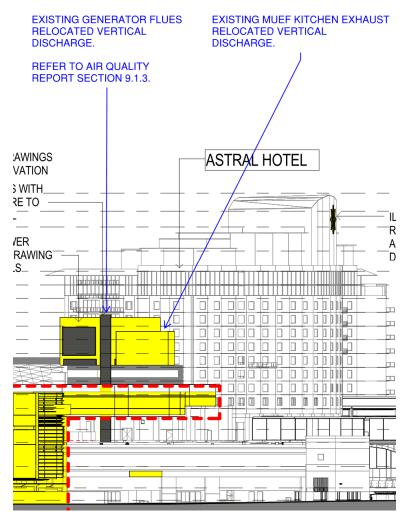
Level 09 Elevation view - Existing MUEF kitchen exhaust discharge location.
